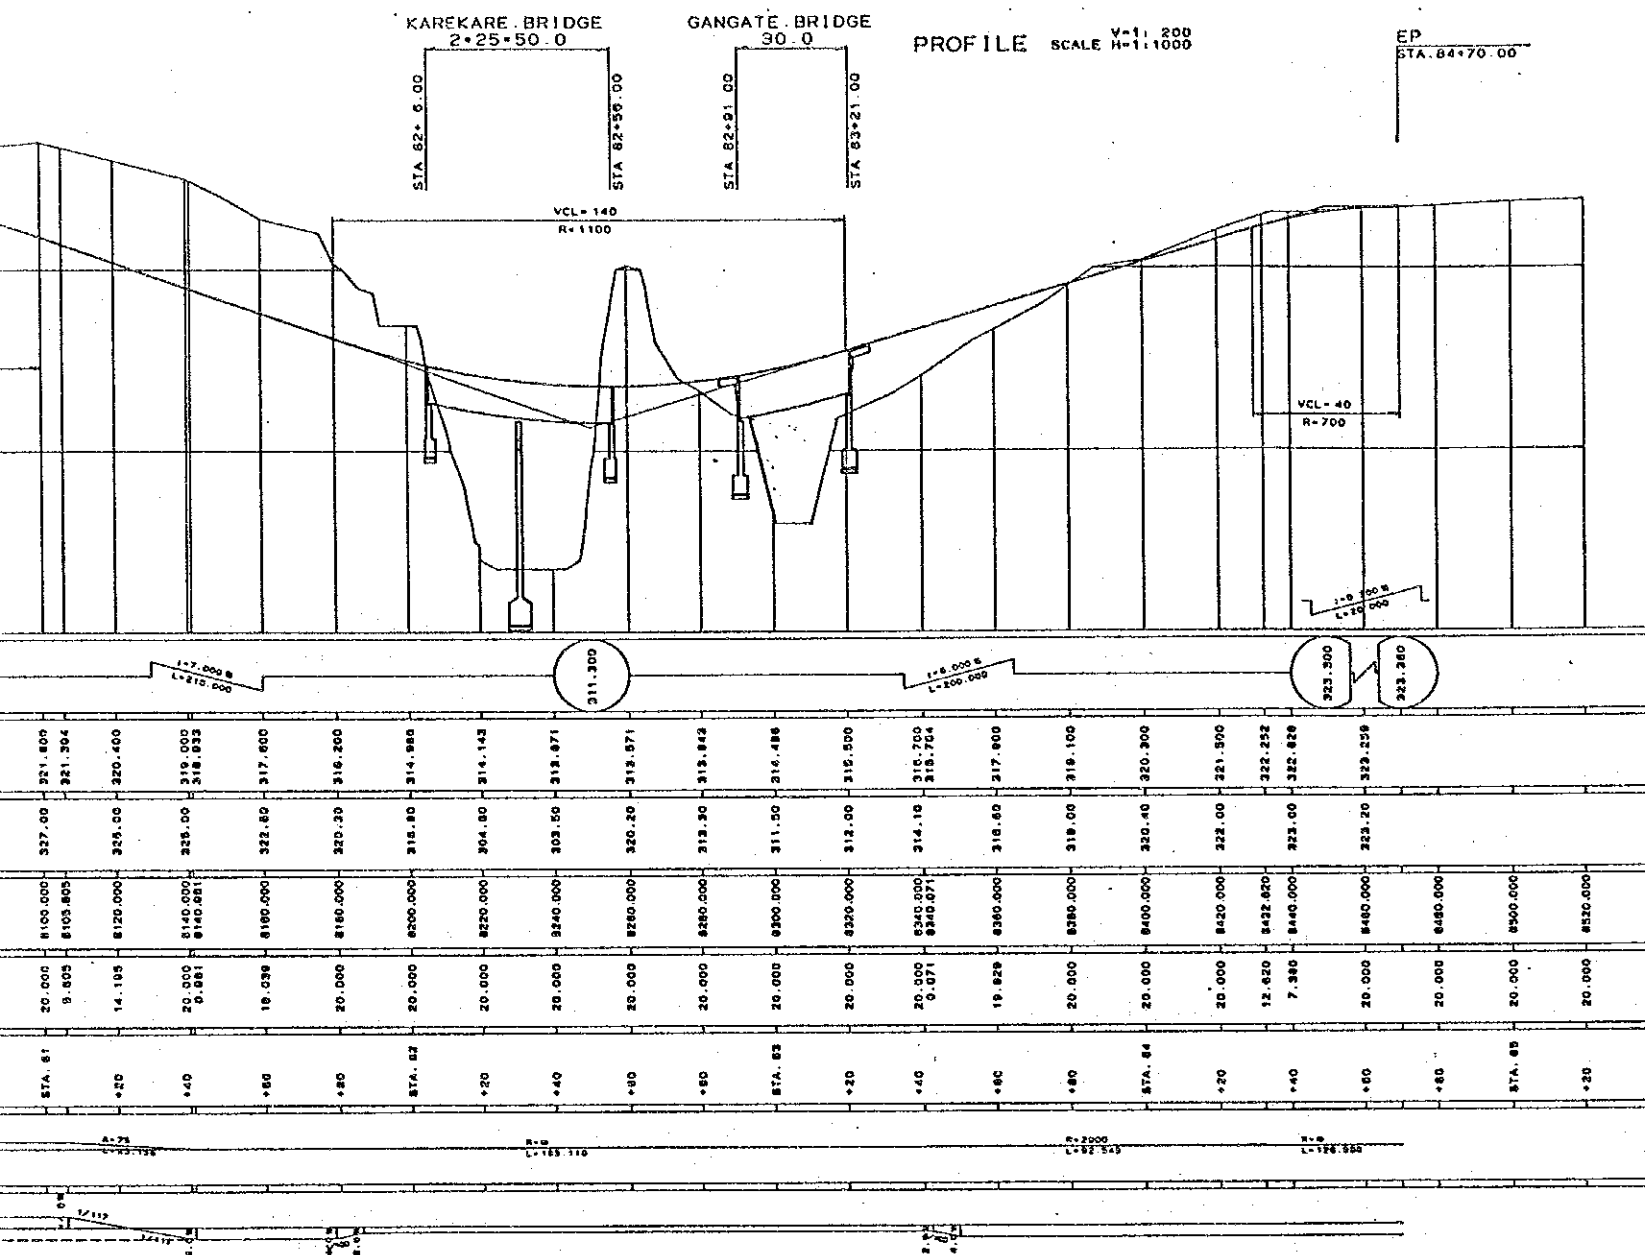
Plan and Profile of Approach Road for Karkare Bridge
